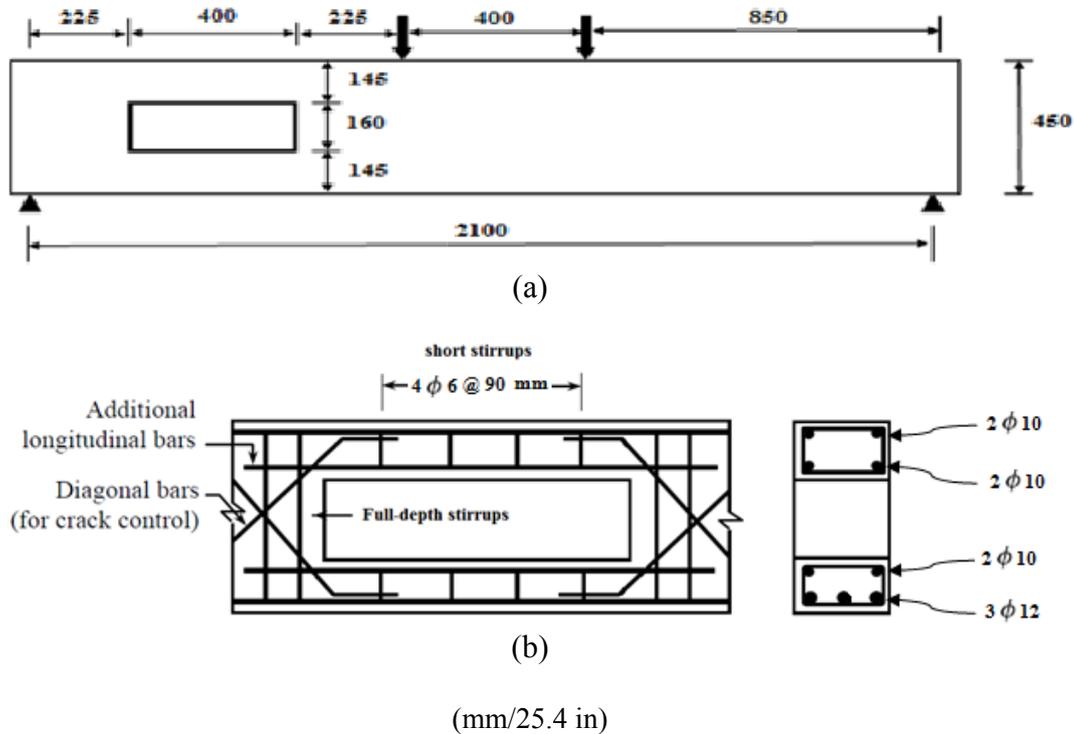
Beam description (a) Opening location (b) Steel reinforcement at the opening
